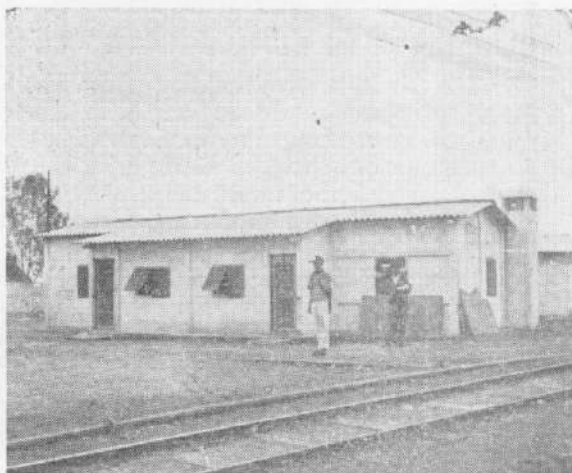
A prefabricated post panel reinforced concrete house which did not suffer any damage due to rock burst.
